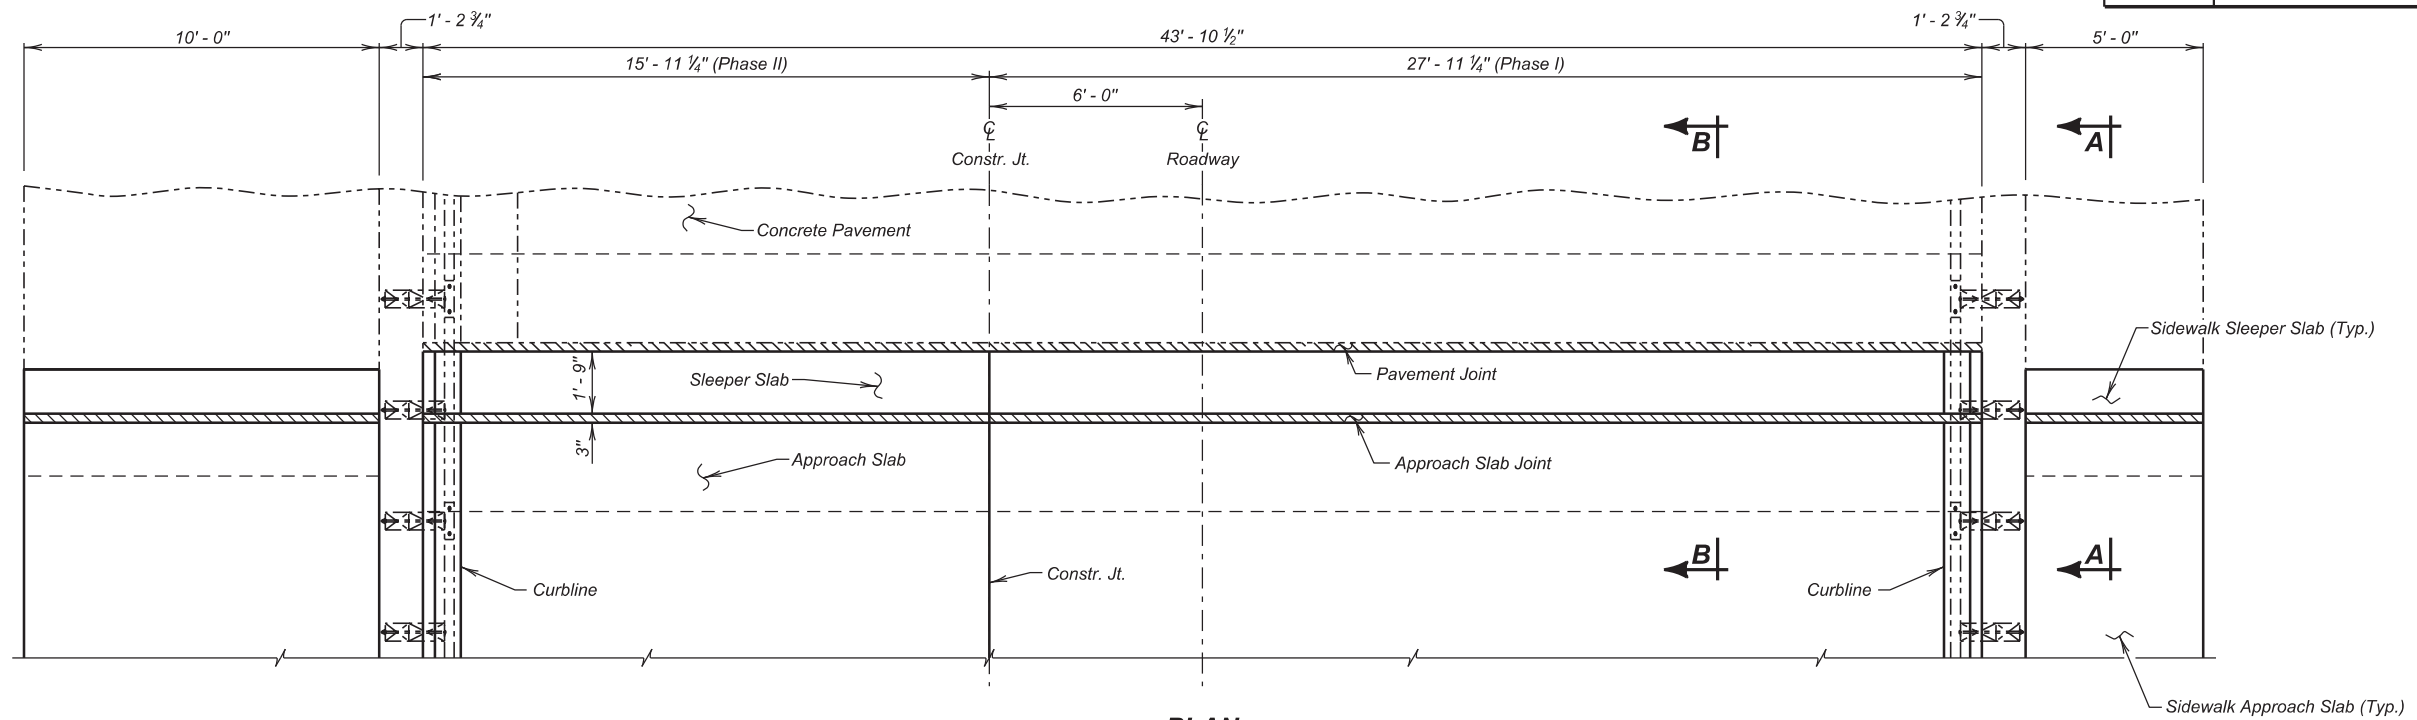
DETAILS OF APPROACH SLAB ADJACENT TO BRIDGE (B)
